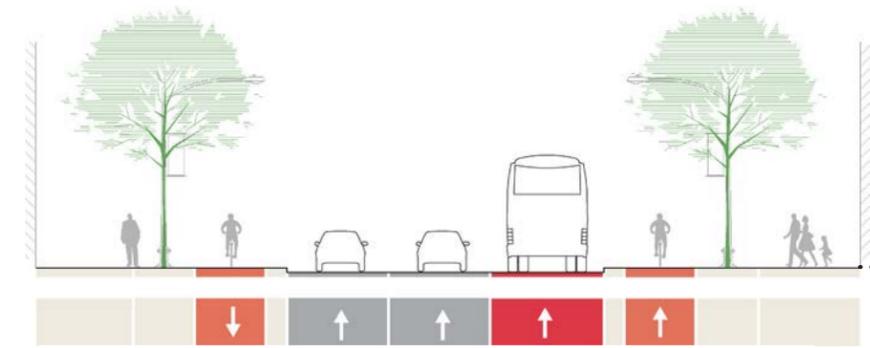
Sixth Street typical section Guadalupe Street to Nueces Street
